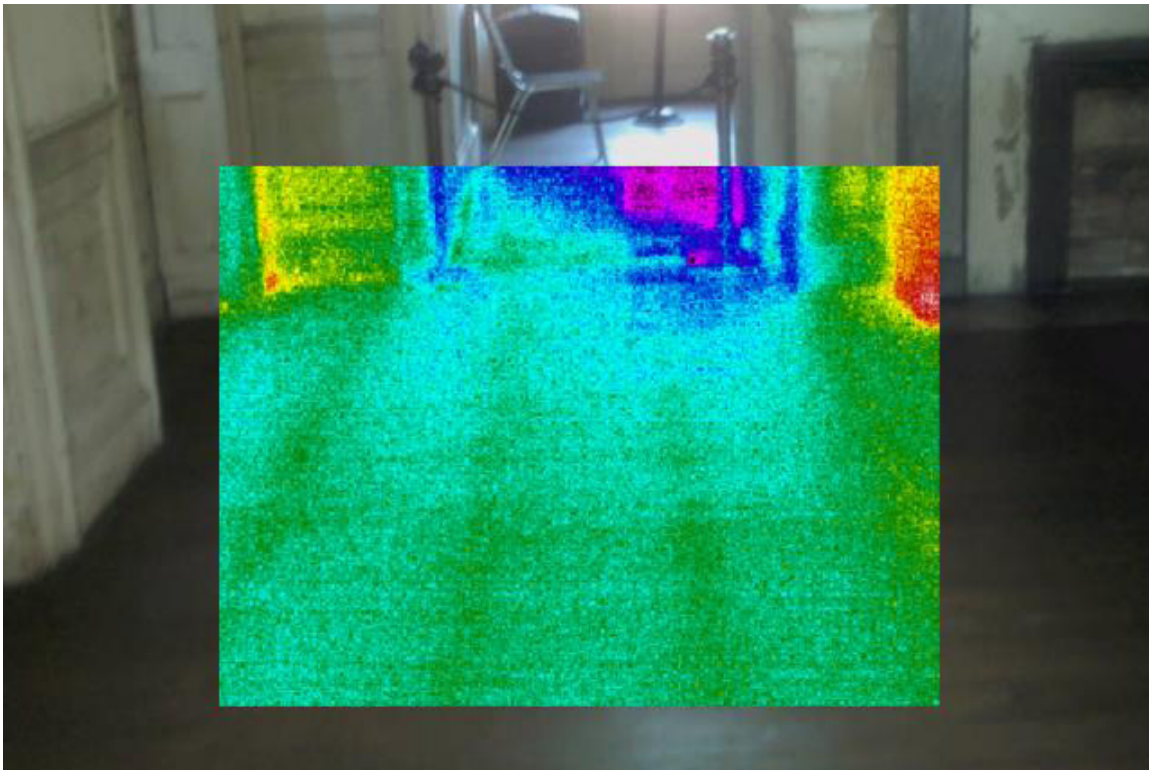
Southwest chamber, ceiling: Passive thermography also allowed for mapping of floor framing members (green). Location of the framing can be further verified by marking the nailing patterns within the flooring.
